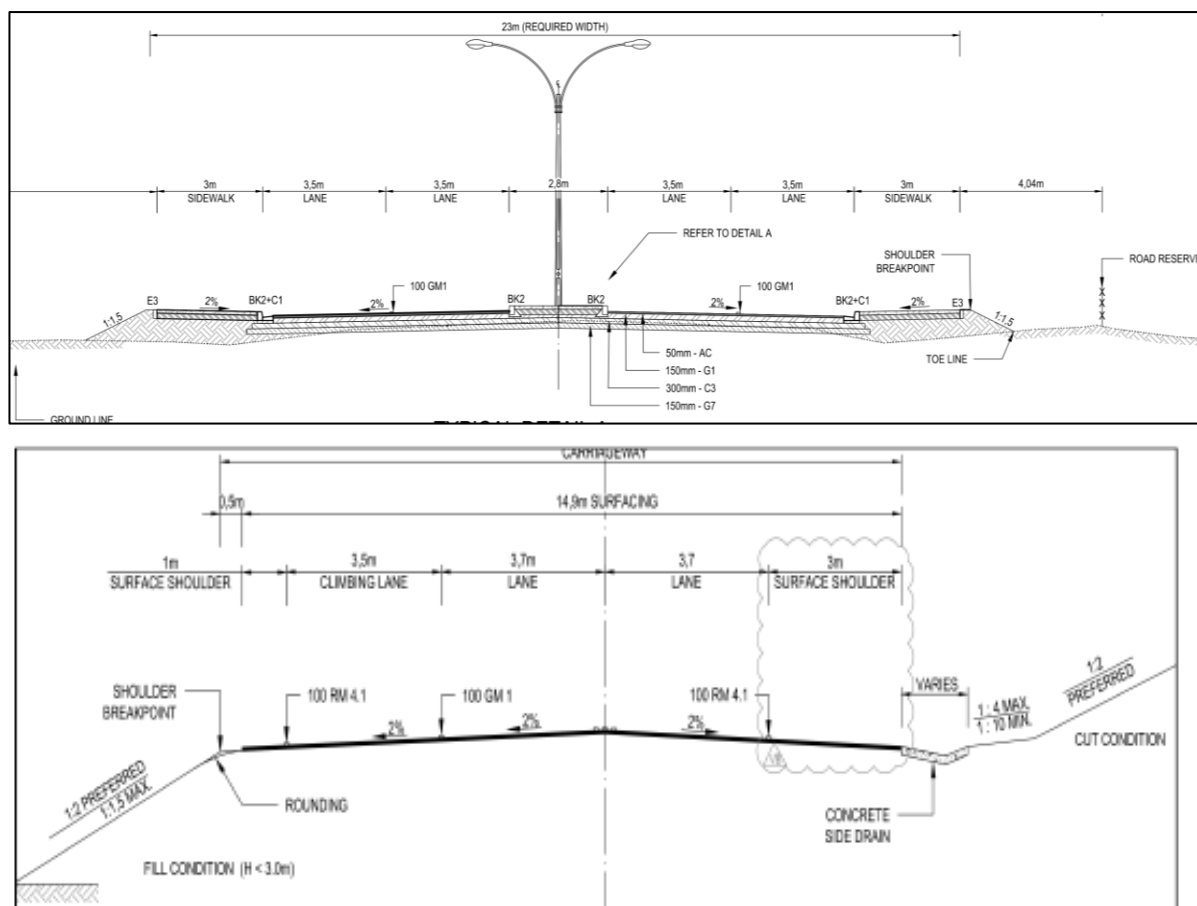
Route Typical cross sections for the proposed upgrades. Top shows the urban sections and bottom shows the rural section.
